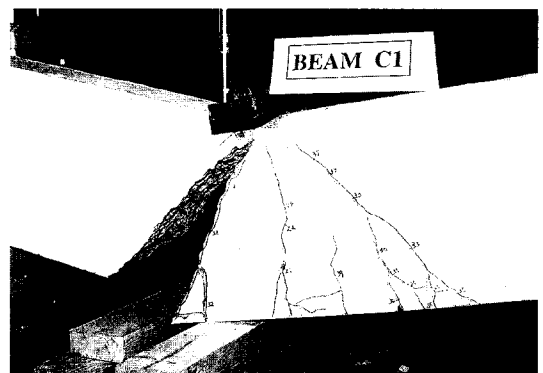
Shear-tendon rupture failure and crack pattern of Beam C1
